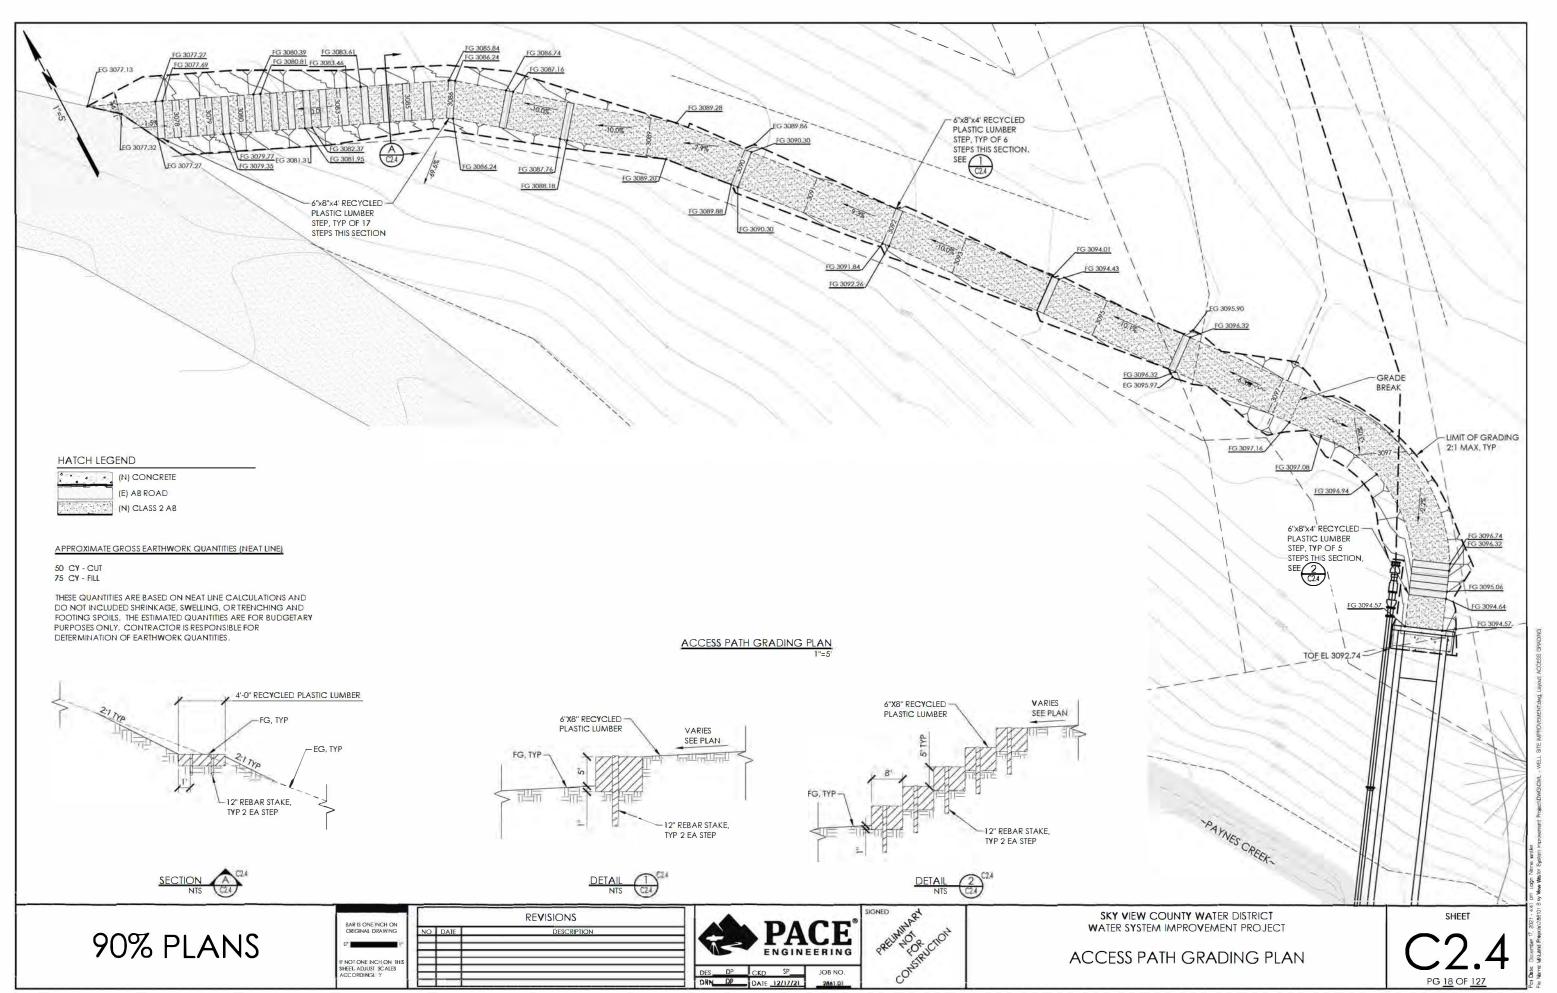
Well Site Access Path - Preliminary Grading Plan
